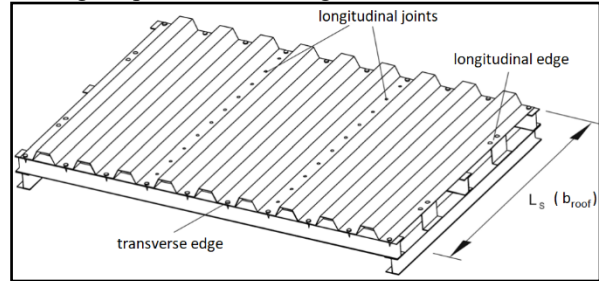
An example of a roof panel with fastening of profiled deck to the purlins on all four edges
